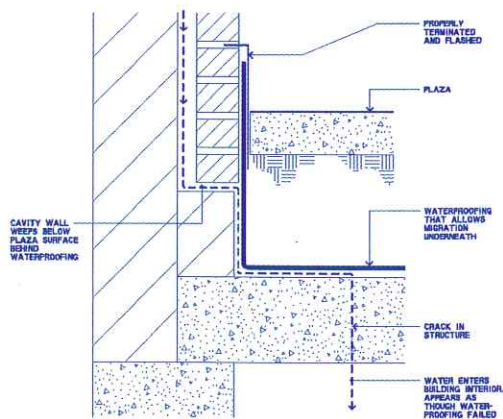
Cavity wall weeps below plaza surface allowing moisture to bypass waterproofing.
